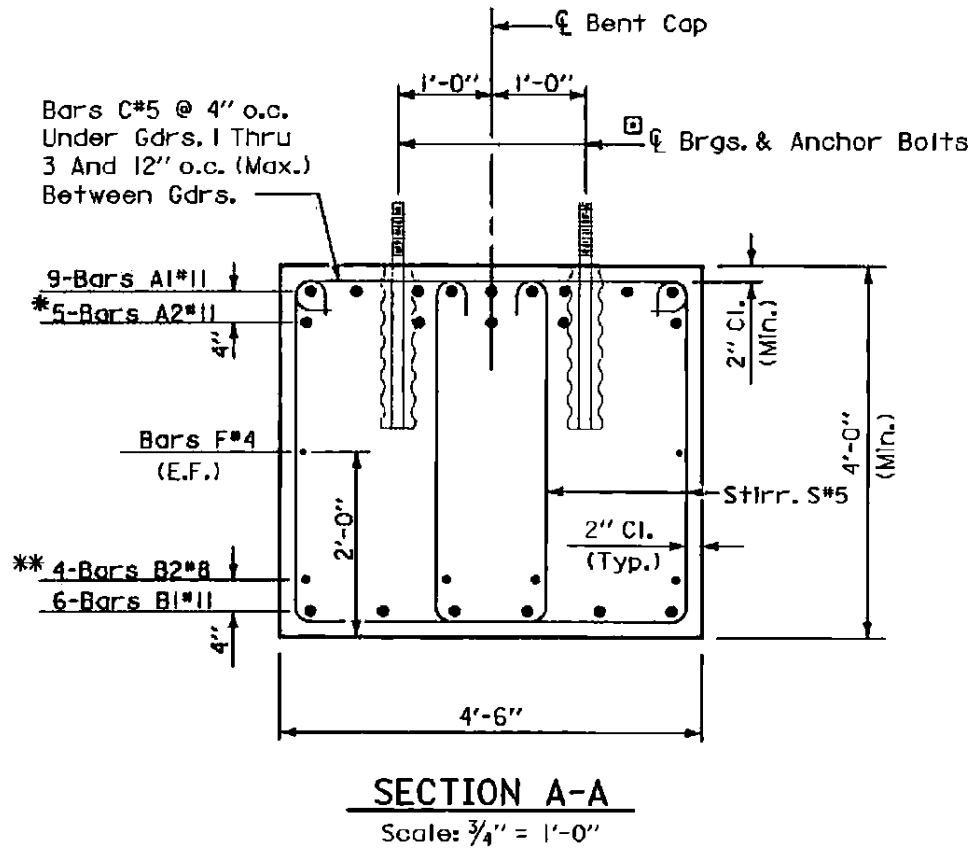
Etowah County Bent 2 pier cap cross section (ALDOT 2011)
